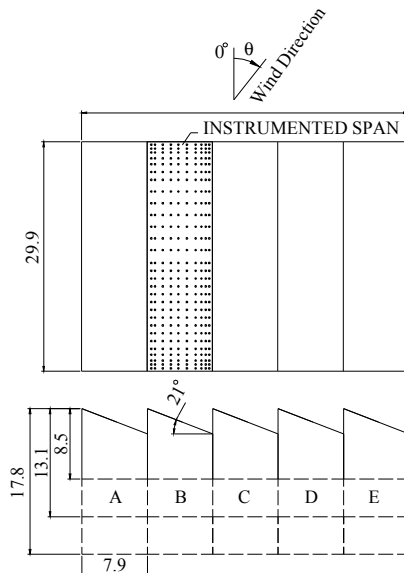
Plan and Elevations of Sawtooth Building Models (dimensions are in m).
